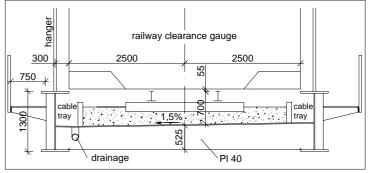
Cross section of a single track steel deck, unit: [mm]
